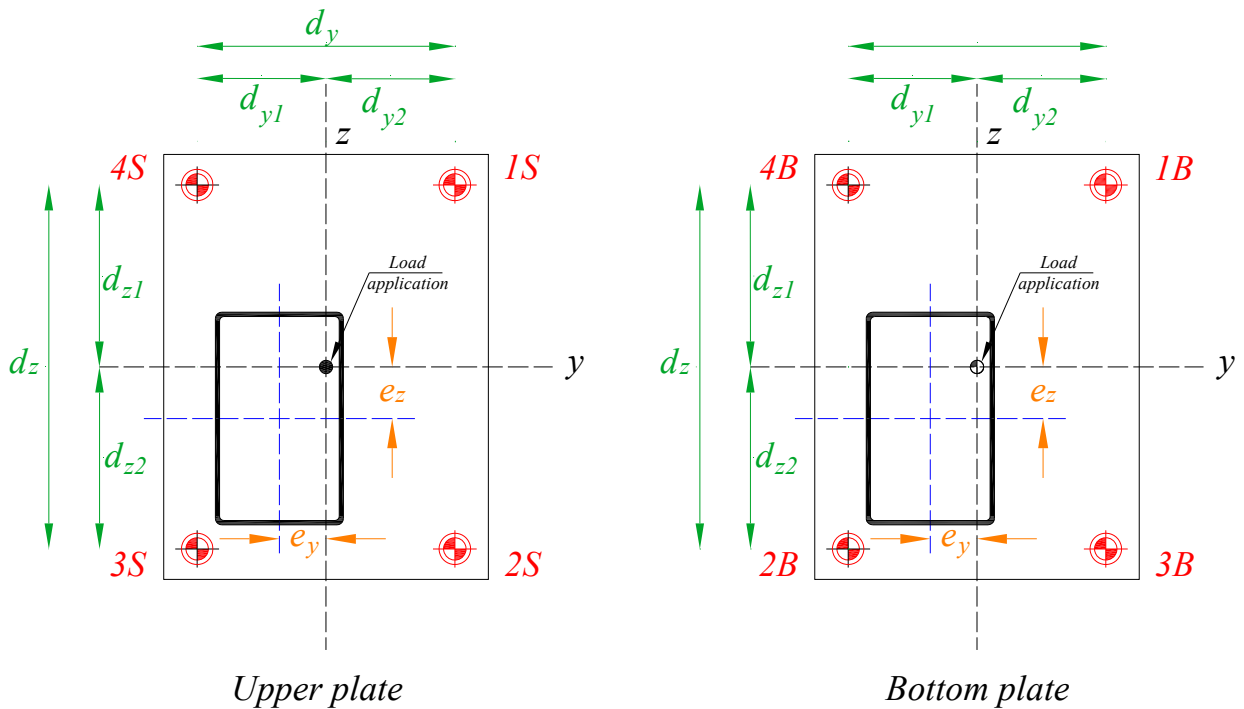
LVDTs and specimen positions on upper and bottom endplates.
